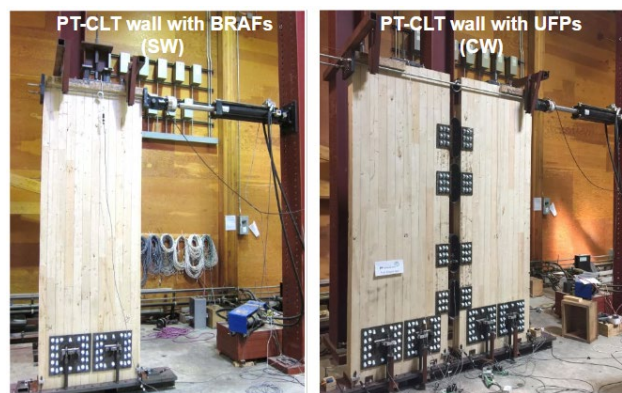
Experiment test setup for quasi-static cyclic testing of PT-CLT walls at FPIInnovations (Picture courtesy of Zhiyong Chen from FPIInnovations).
